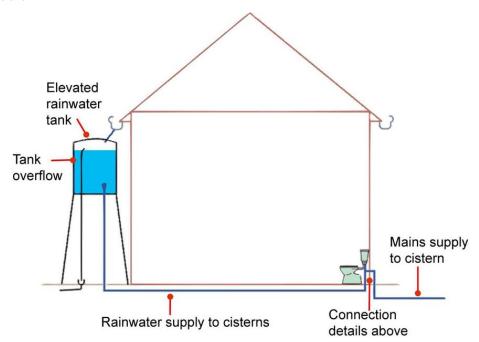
Typical schematic layout with an elevated rainwater tank VBA owned image 2023
